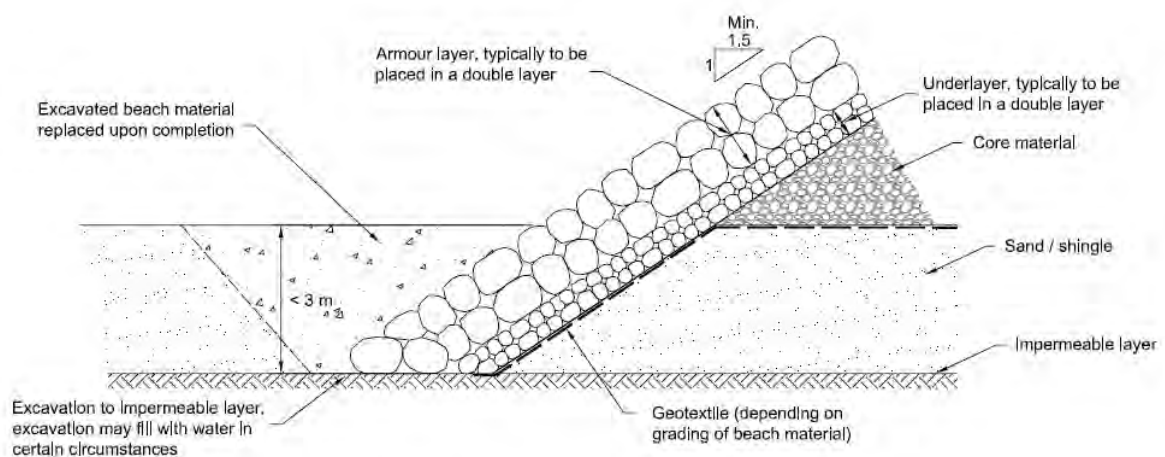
Cross-section of a Typical Rock Revetment Seawall (CIRIA, 2007)
